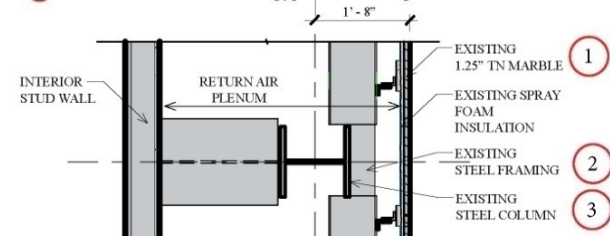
7: Existing Exterior Wall. (Source: QEA.)
